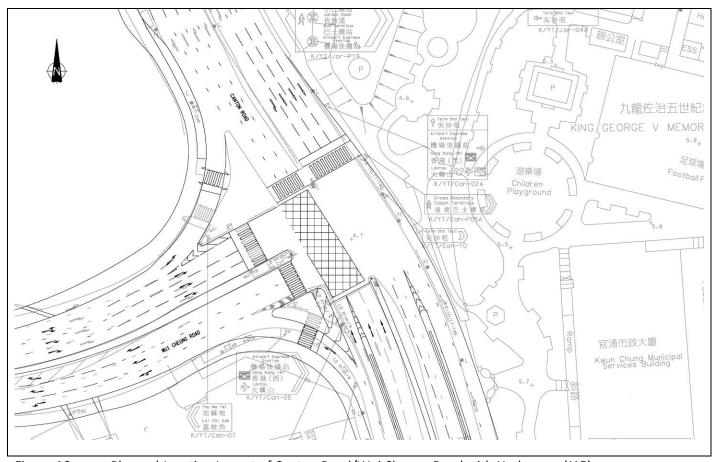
Planned Junction Layout of Canton Road/Wui Cheung Road with Underpass (J15)
